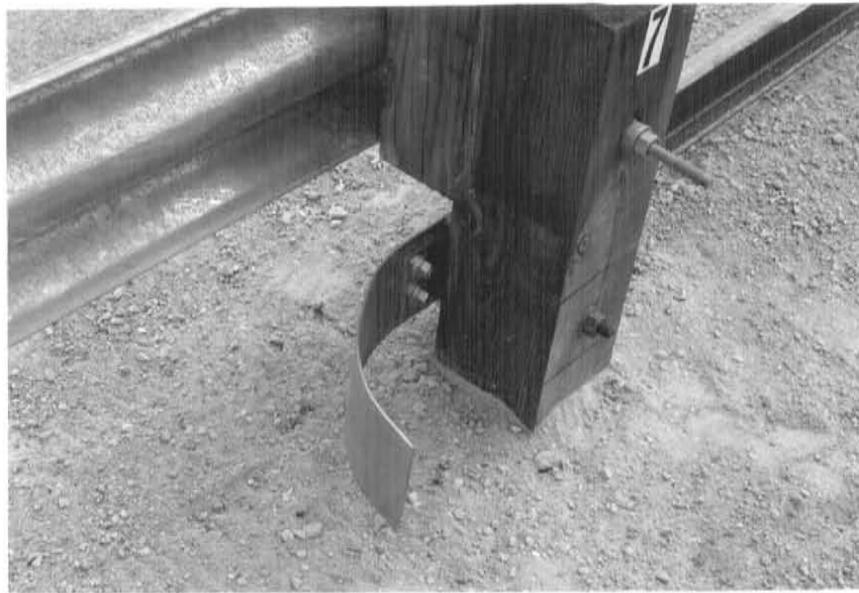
Arizona guardrail transition to concrete half barriers before test 7155-8. (Continued)
